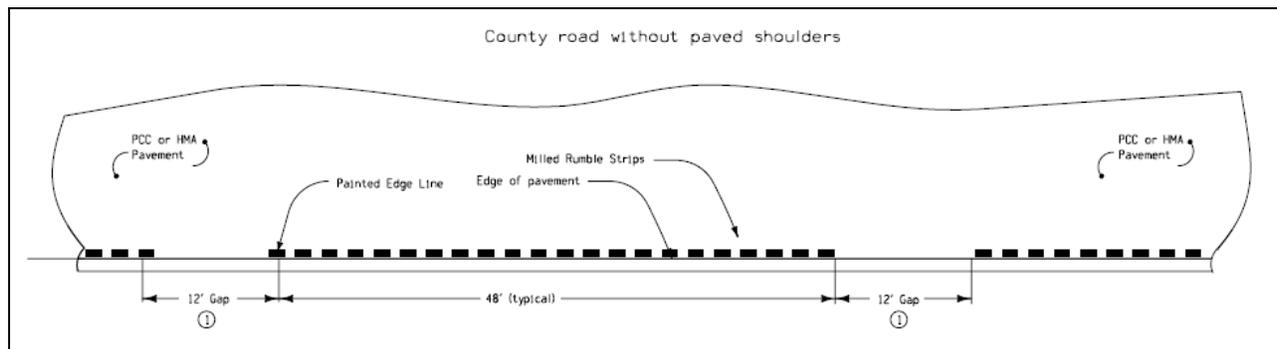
Rumble stripe layout for sections with no paved shoulders
